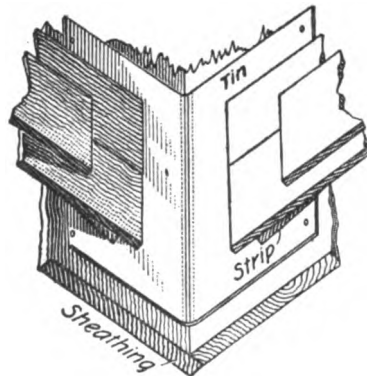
Wood Strips on Valley to Raise Shingles and Prevent Tin from Rusting
